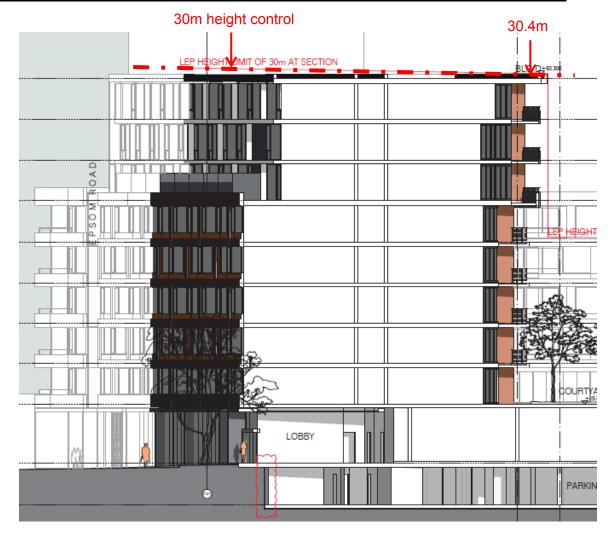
Proposed Building D demonstrating breach of 30m height control
